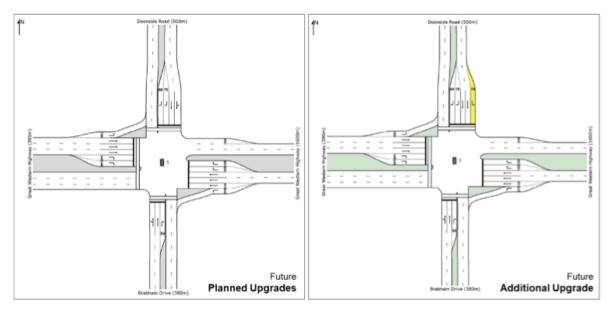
GWH / Doonside Road / Brabham Drive – Potential Upgrade (Source: Ason Group, 2019)
